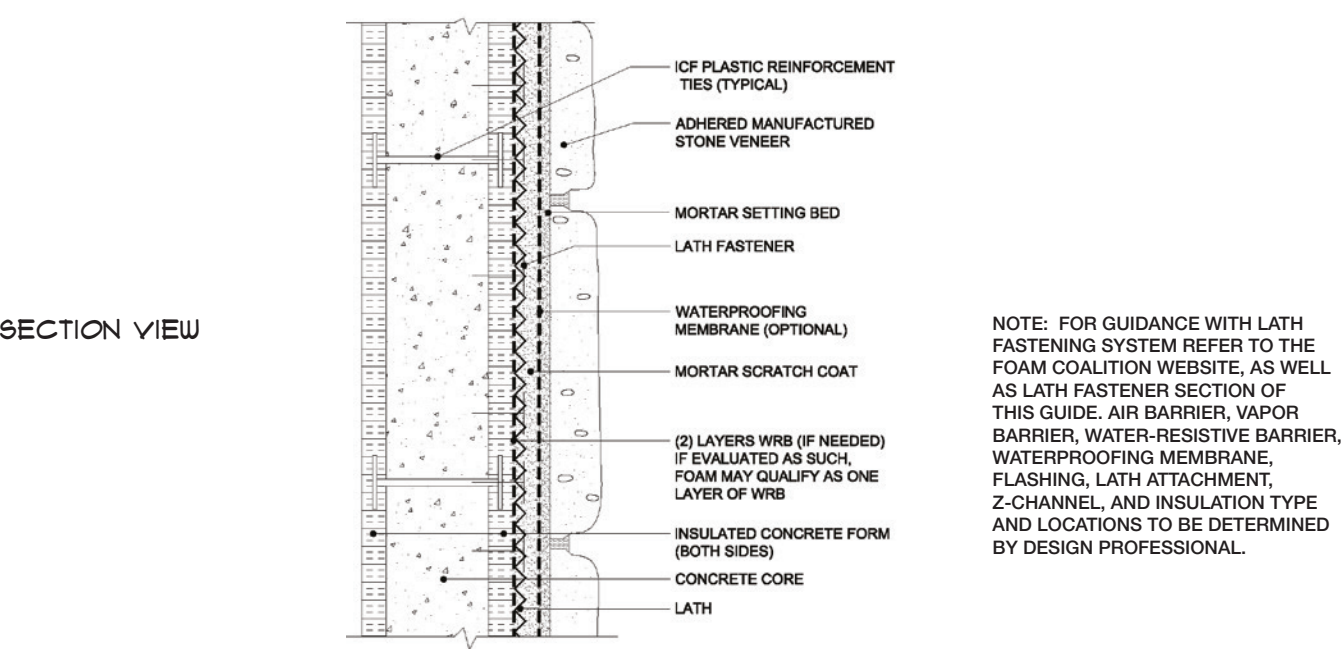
WALL-SECTION INSULATED CONCRETE FORM (ICF)-TOP VIEW
